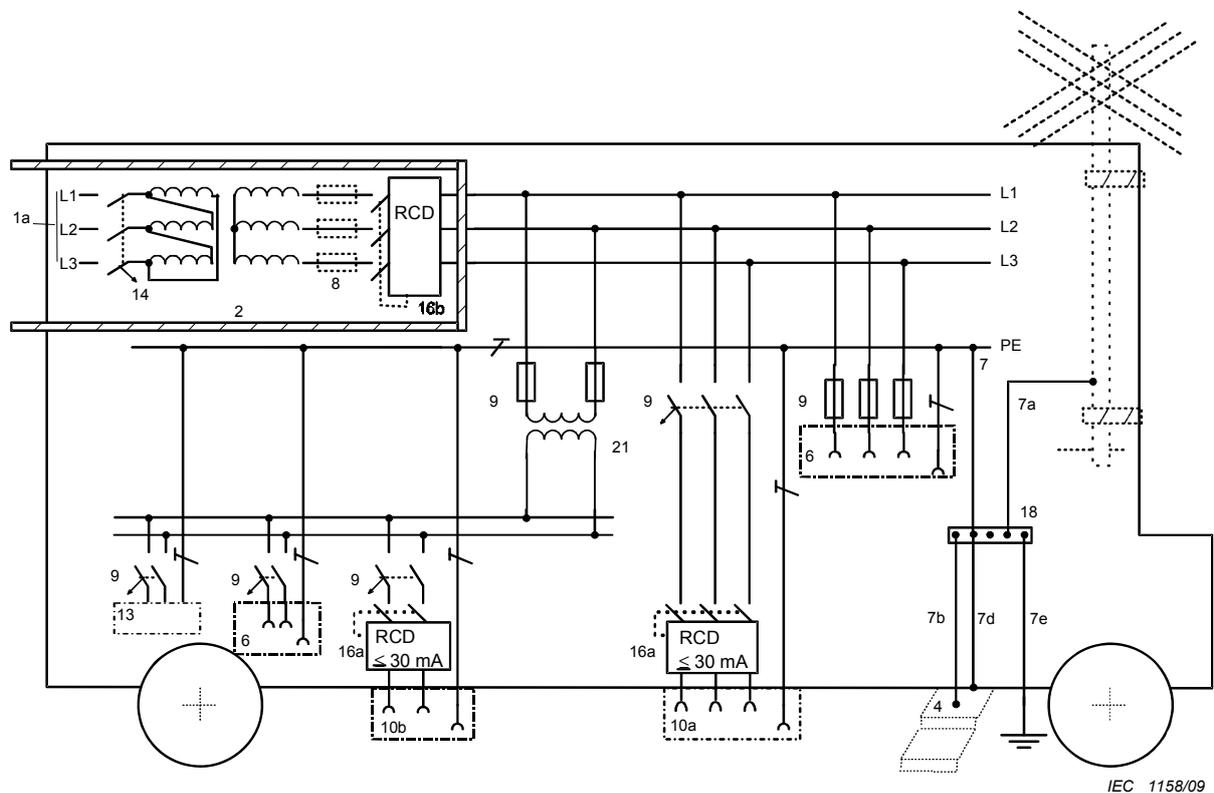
Example of connection to a fixed electrical installation with any type of earthing system using a simple separation transformer and an IT system with an earth electrode
